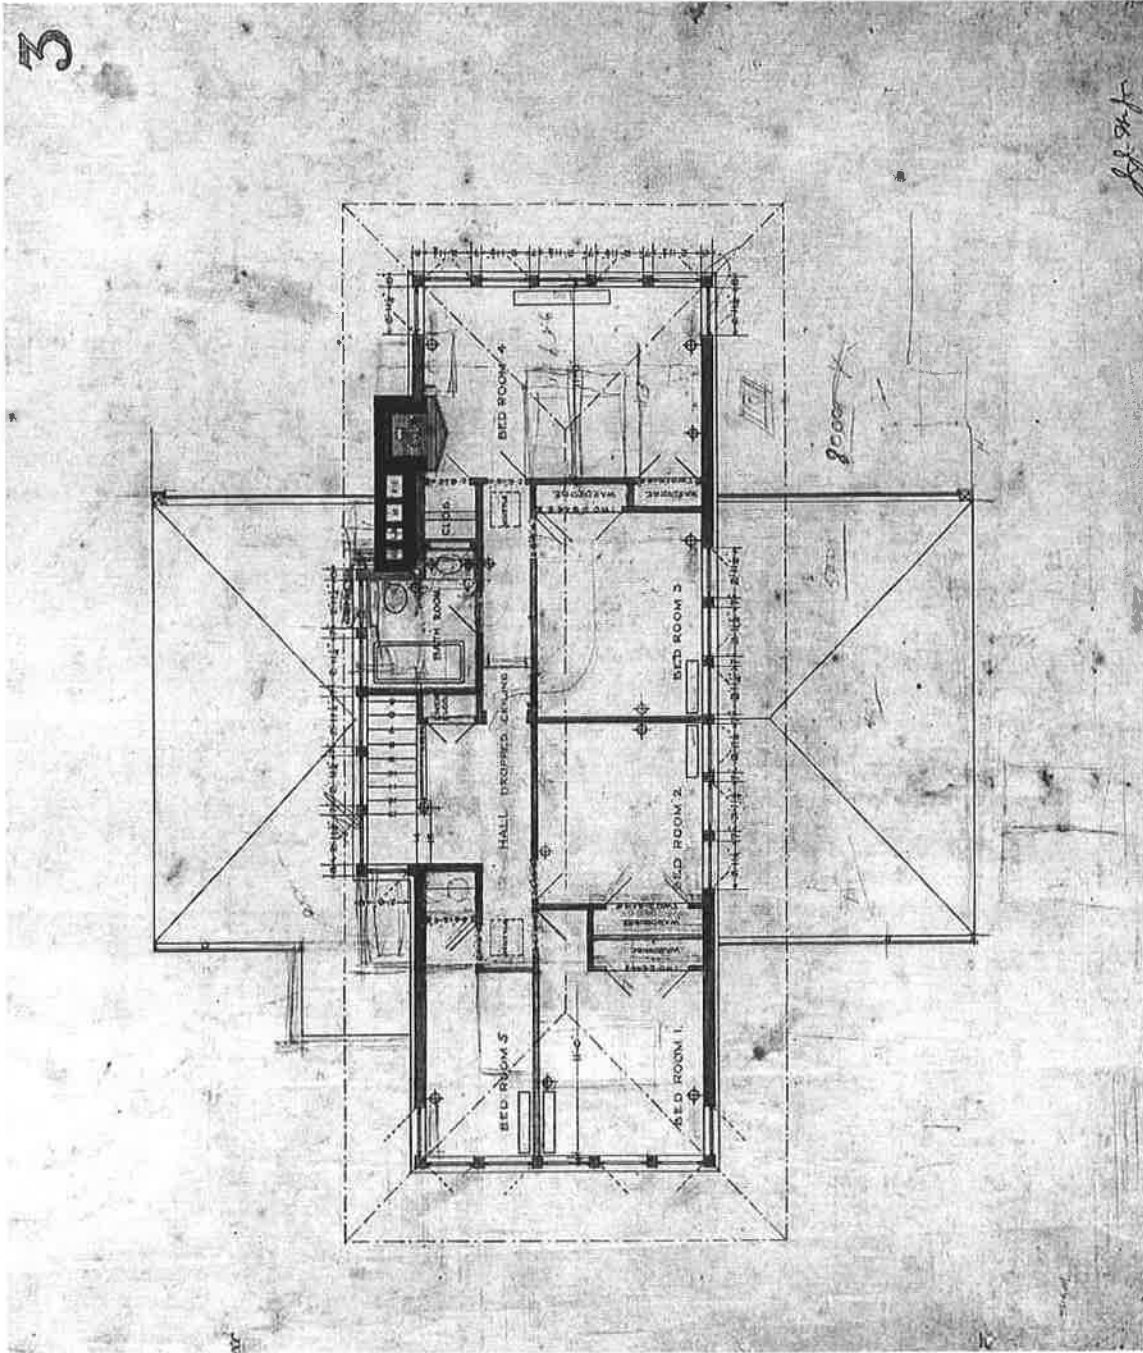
Original 1903 Joseph J. Walser House second floor plan
